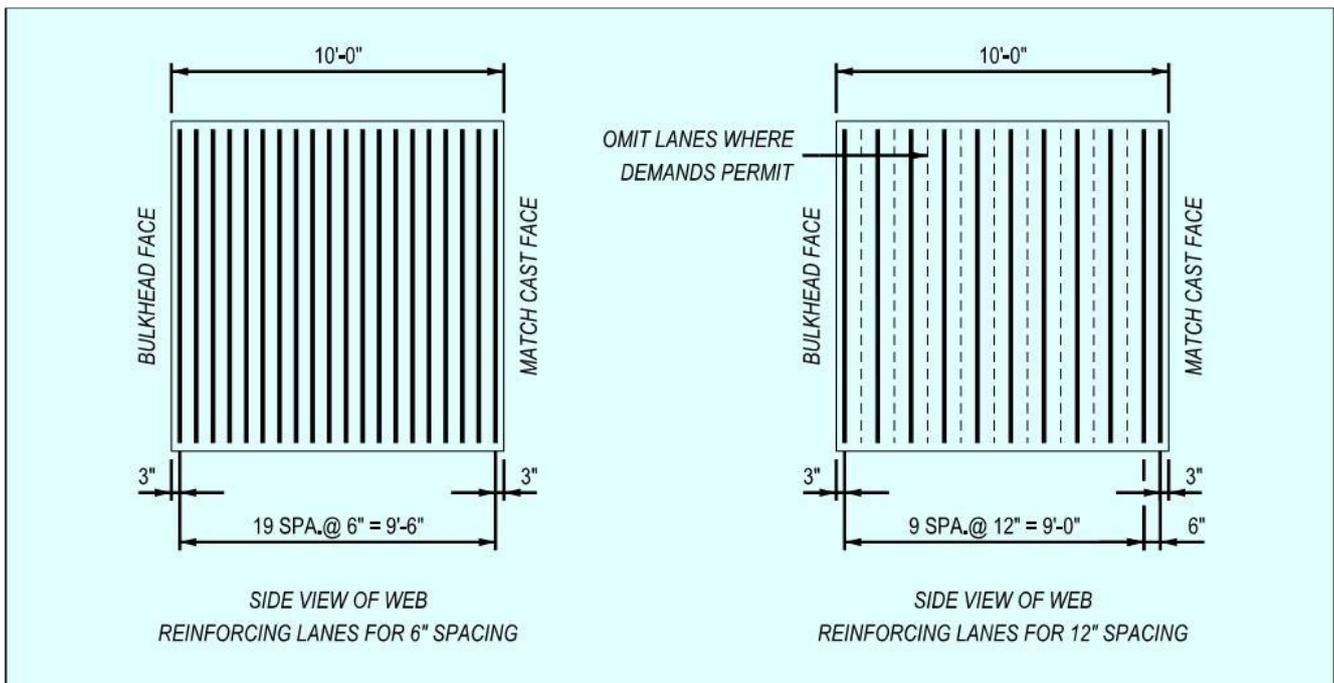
Rebar Layout Methodology. All the dimensions on this figure are in imperial feet and inches
